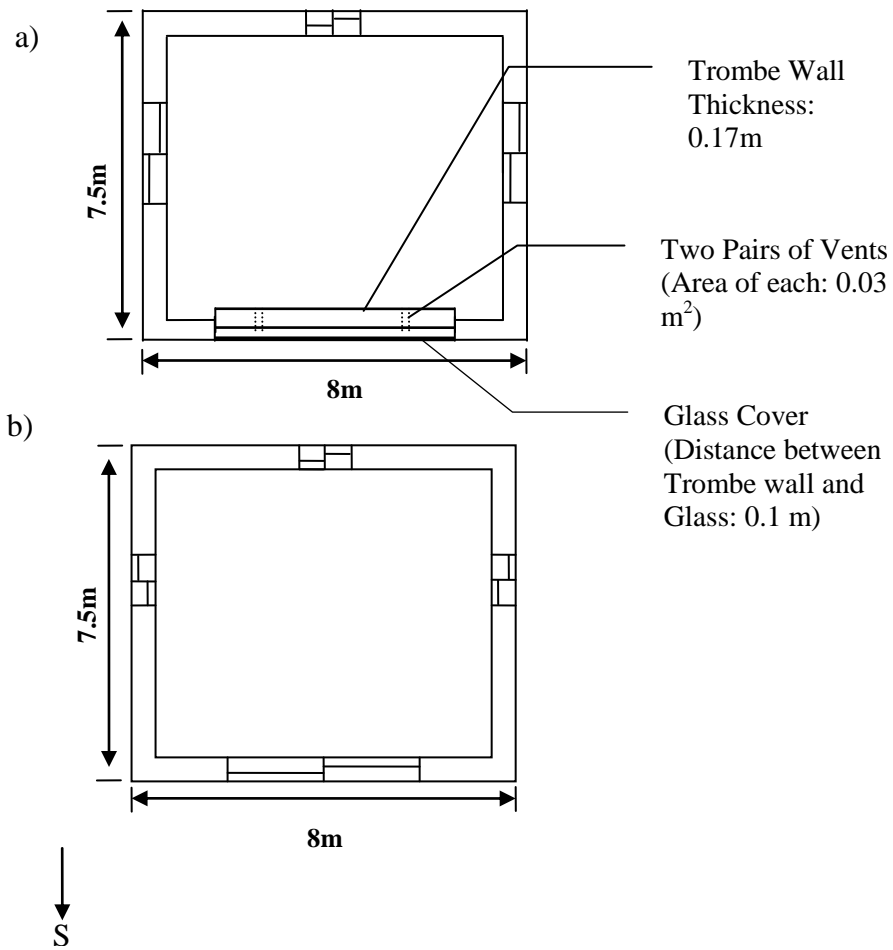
Plan view of the Hypothetical house: a) Ground Floor, b) First Floor
